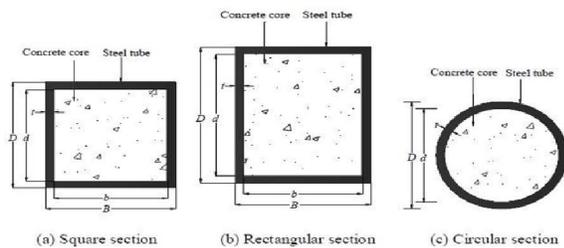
Cross-sections of concrete-filled steel tubular beam-columns.
